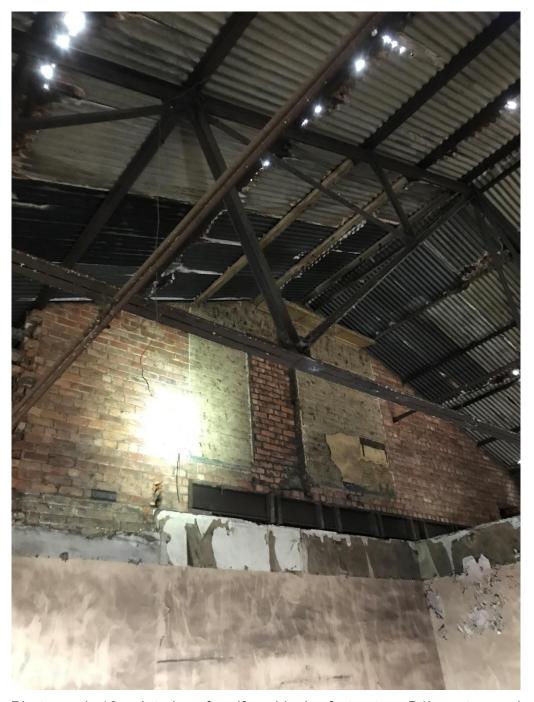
Interior of welfare block of structure B1b, note poor condition of corrugated metal roof
